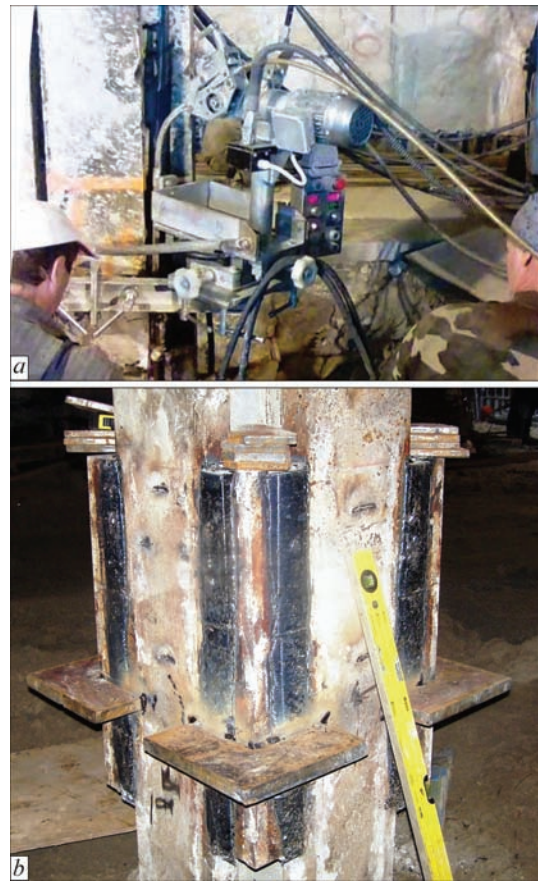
Appearance of electroslag welds after welding-up the shrinkage cavity on their linear part: 1 — reinforcing element; 2 — building column girths; 3 — welds
